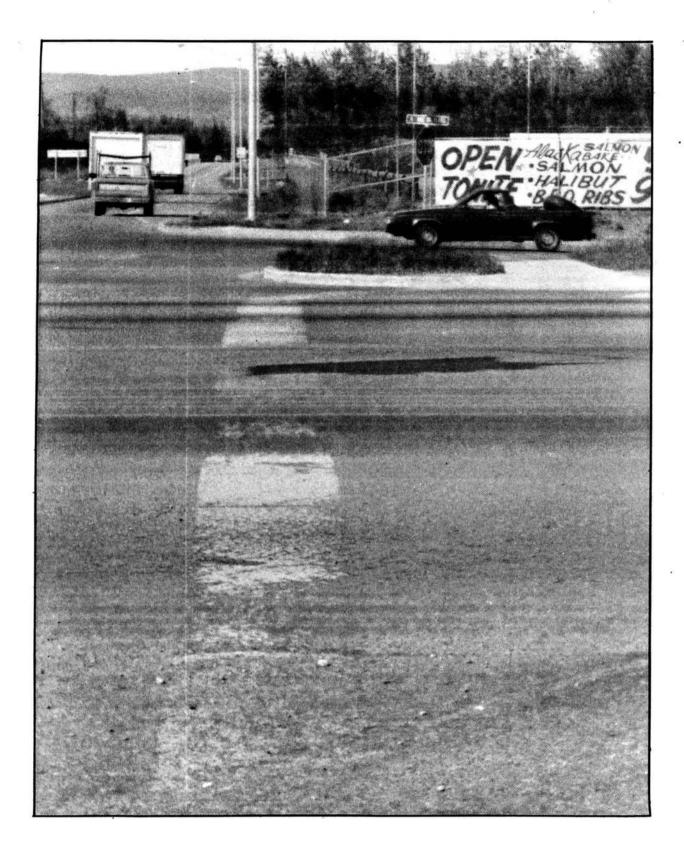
Missing double centerline striping with visible construction joint at crown of road section (Douglas-Cordova St. Project). Project was constructed late in the season. Poor bonding may have resulted from rapid pavement cooling before final rolling.
